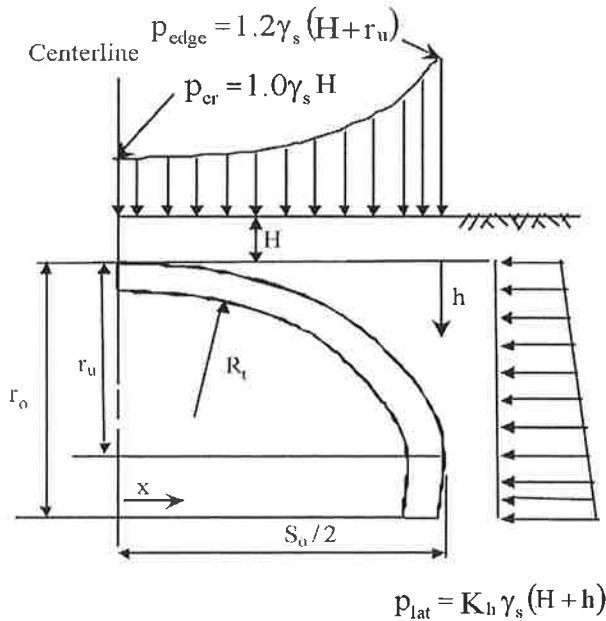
Pressure Distribution on Long-Span Concrete Culverts
